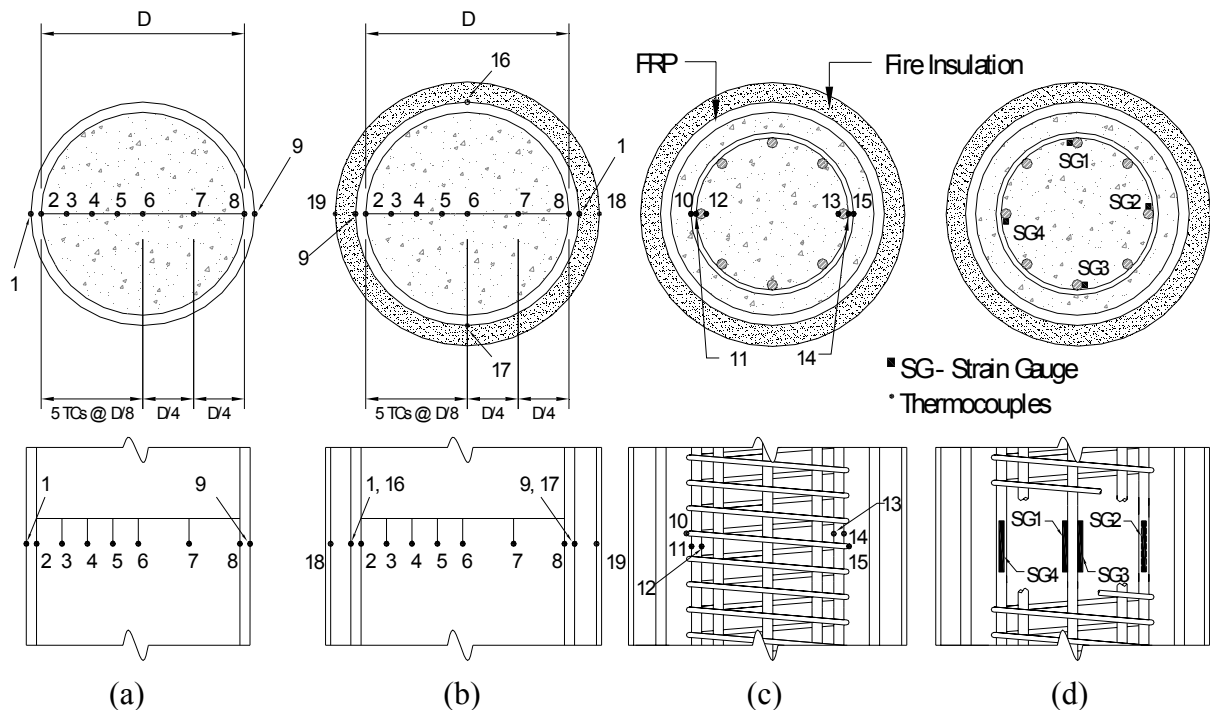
Location and numbering of thermocouples and strain gauges at mid-height: (a) Thermocouples within the concrete and on FRP surface of Column 3, (b) Thermocouples within the concrete and on FRP surface of Column 4, (c) Thermocouples on the reinforcing steel of Columns 3 and 4, and (d) Strain gauges on the reinforcing steel on Columns 3 and 4
